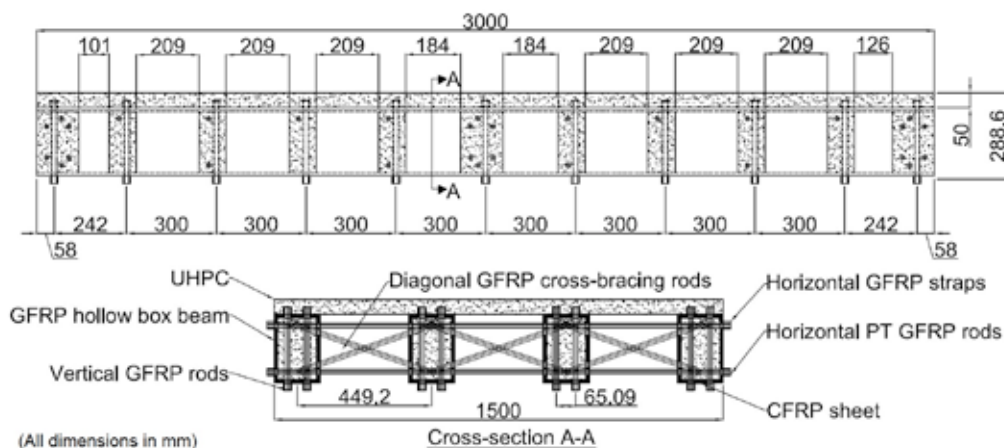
Elevation view of hybrid bridge deck system with cross-sectional view at mid-span
